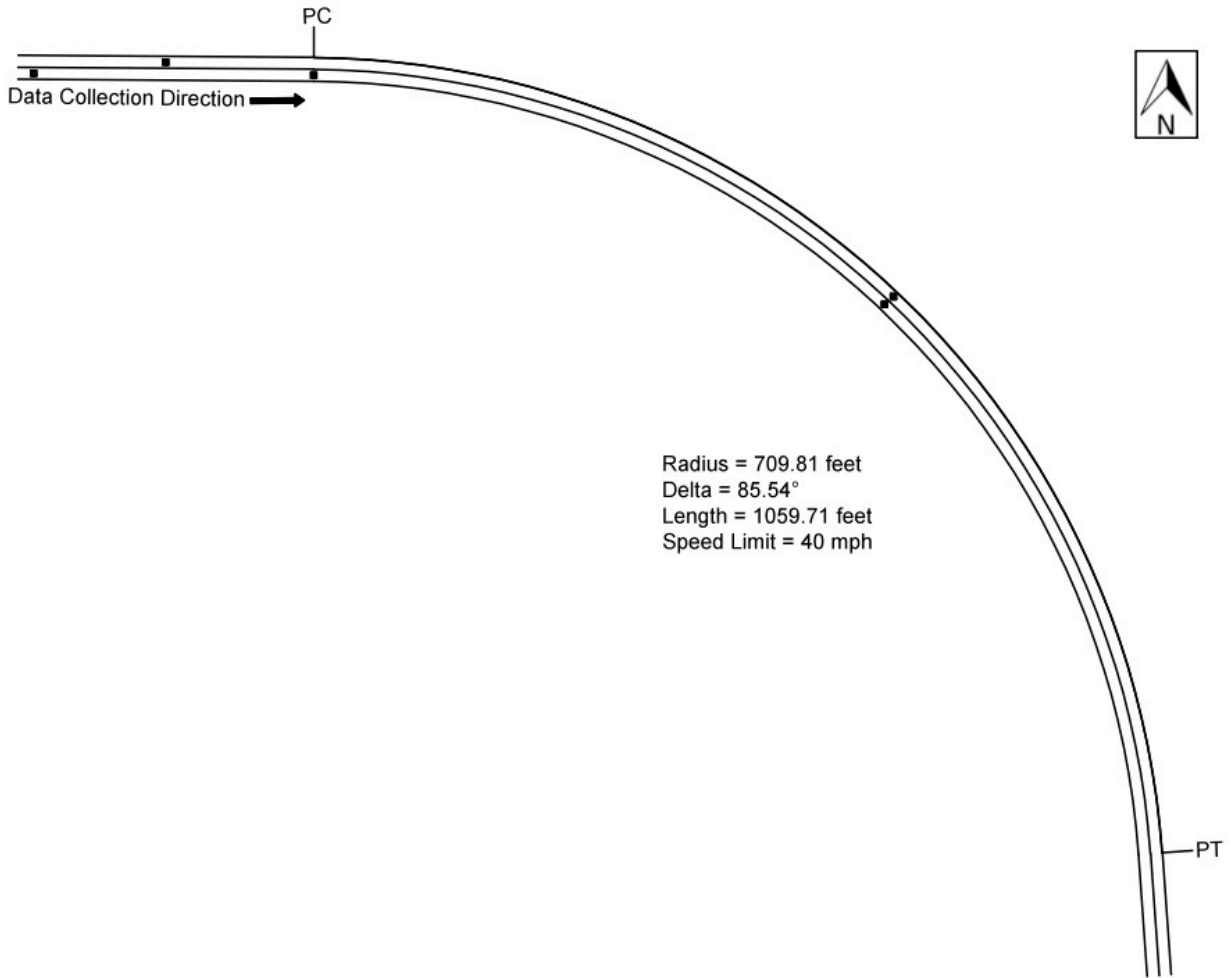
Diagram. Geometric layout of Alabama Location #5 (not to scale).
